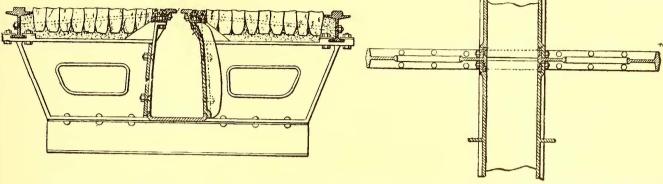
TRANSVERSE SECTION OF TUNNEL,
